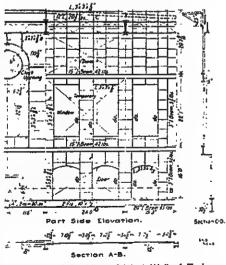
Steel Studding of West Wall of Train Waiting-Room.
